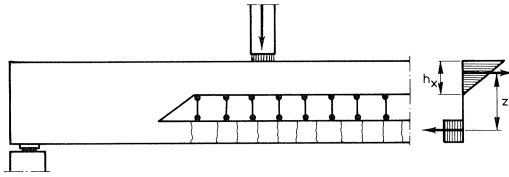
Simplified model of a structural concrete beam with a cracked tensile zone.
